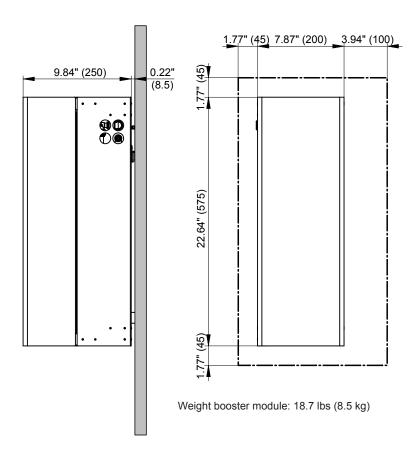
Dimensions booster module (dimensions in inch (mm))
